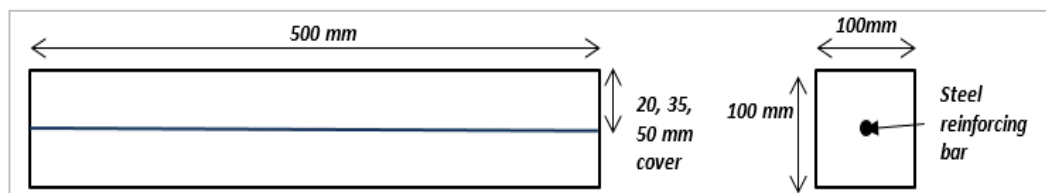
Side elevation view and cross-section view of rebar in concrete prism.
